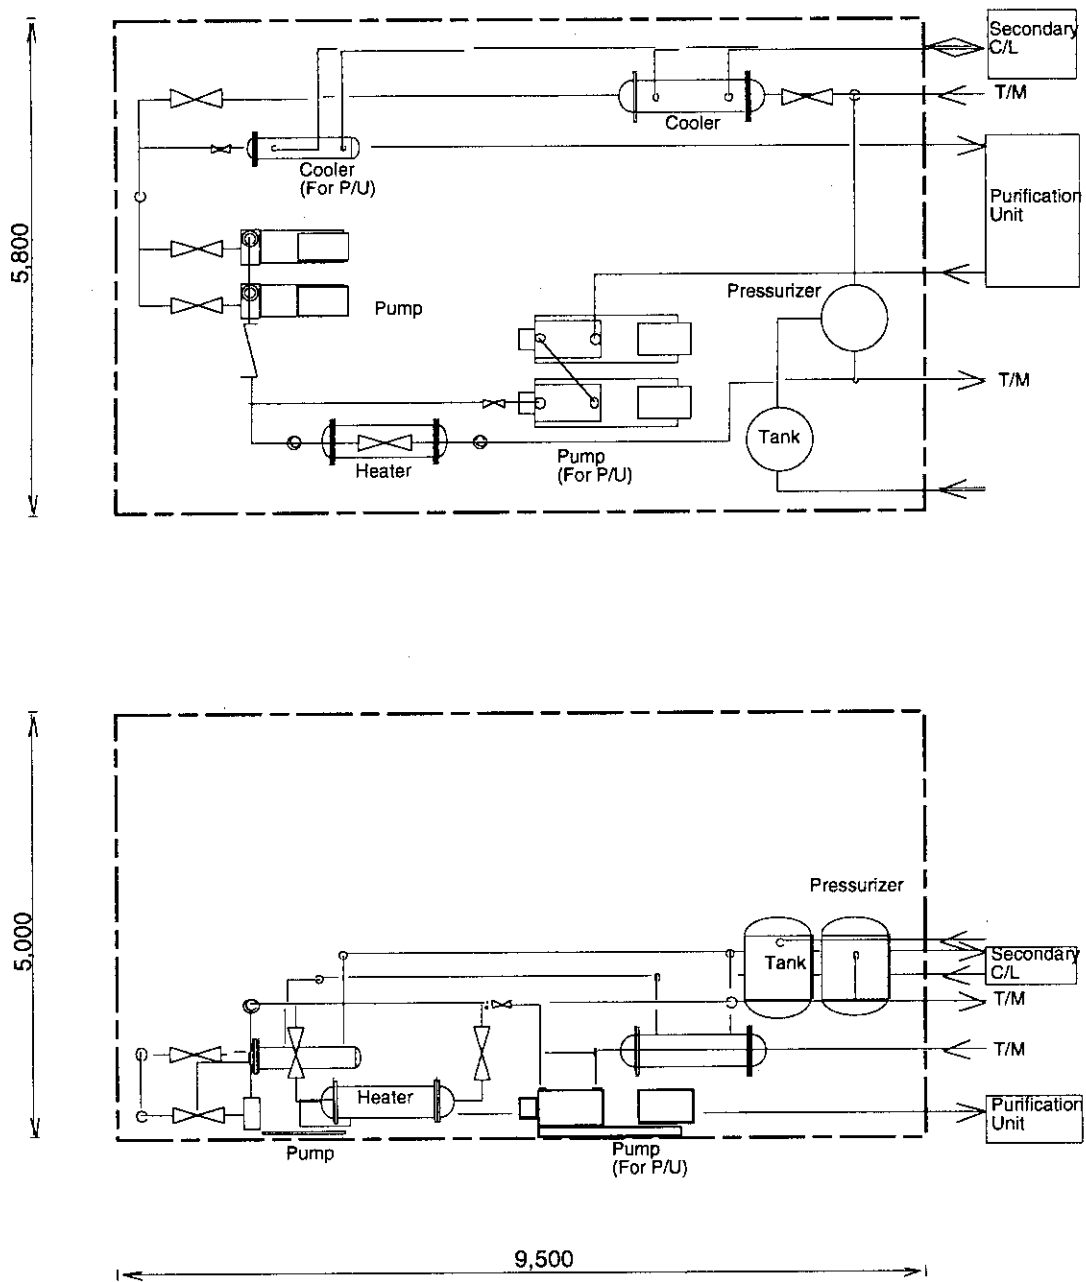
Cooling system Layout plan for Water-cooled test module
